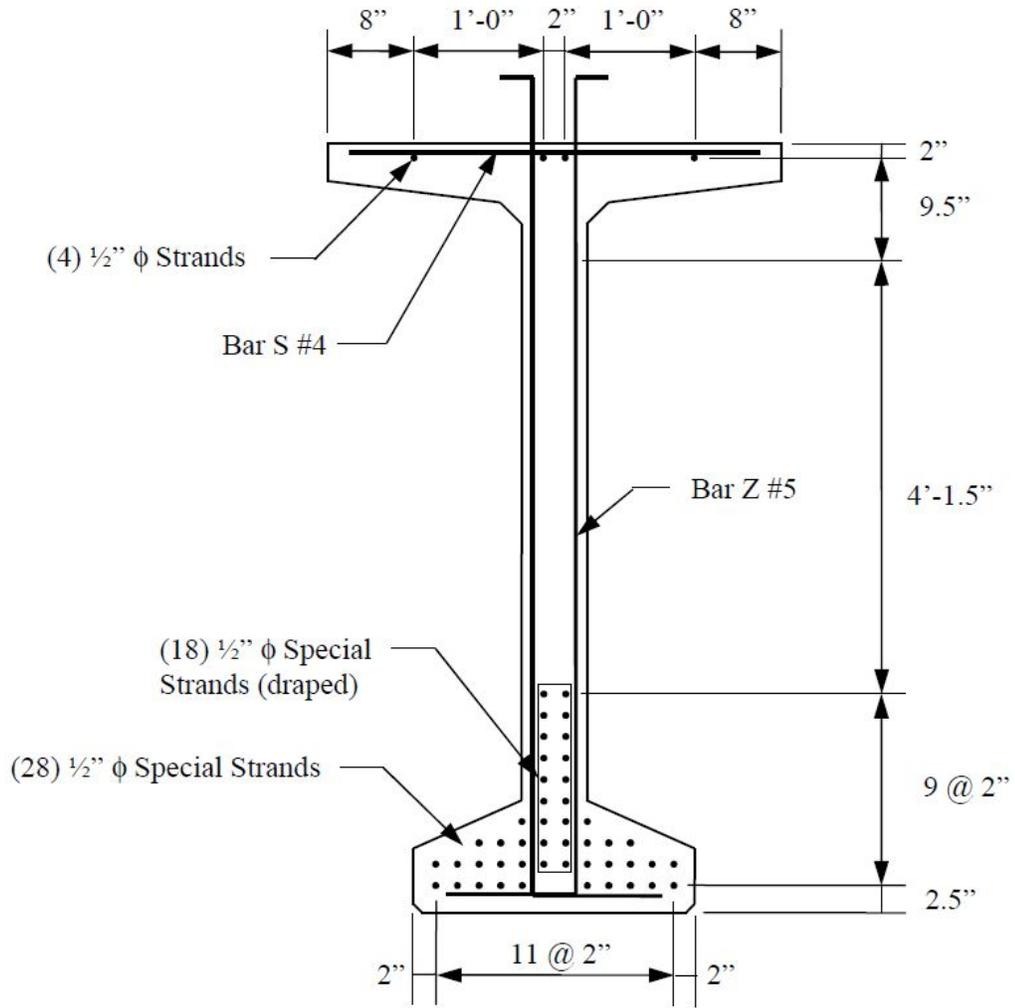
Mild steel and strand arrangement for BT-72 girder at midspan
